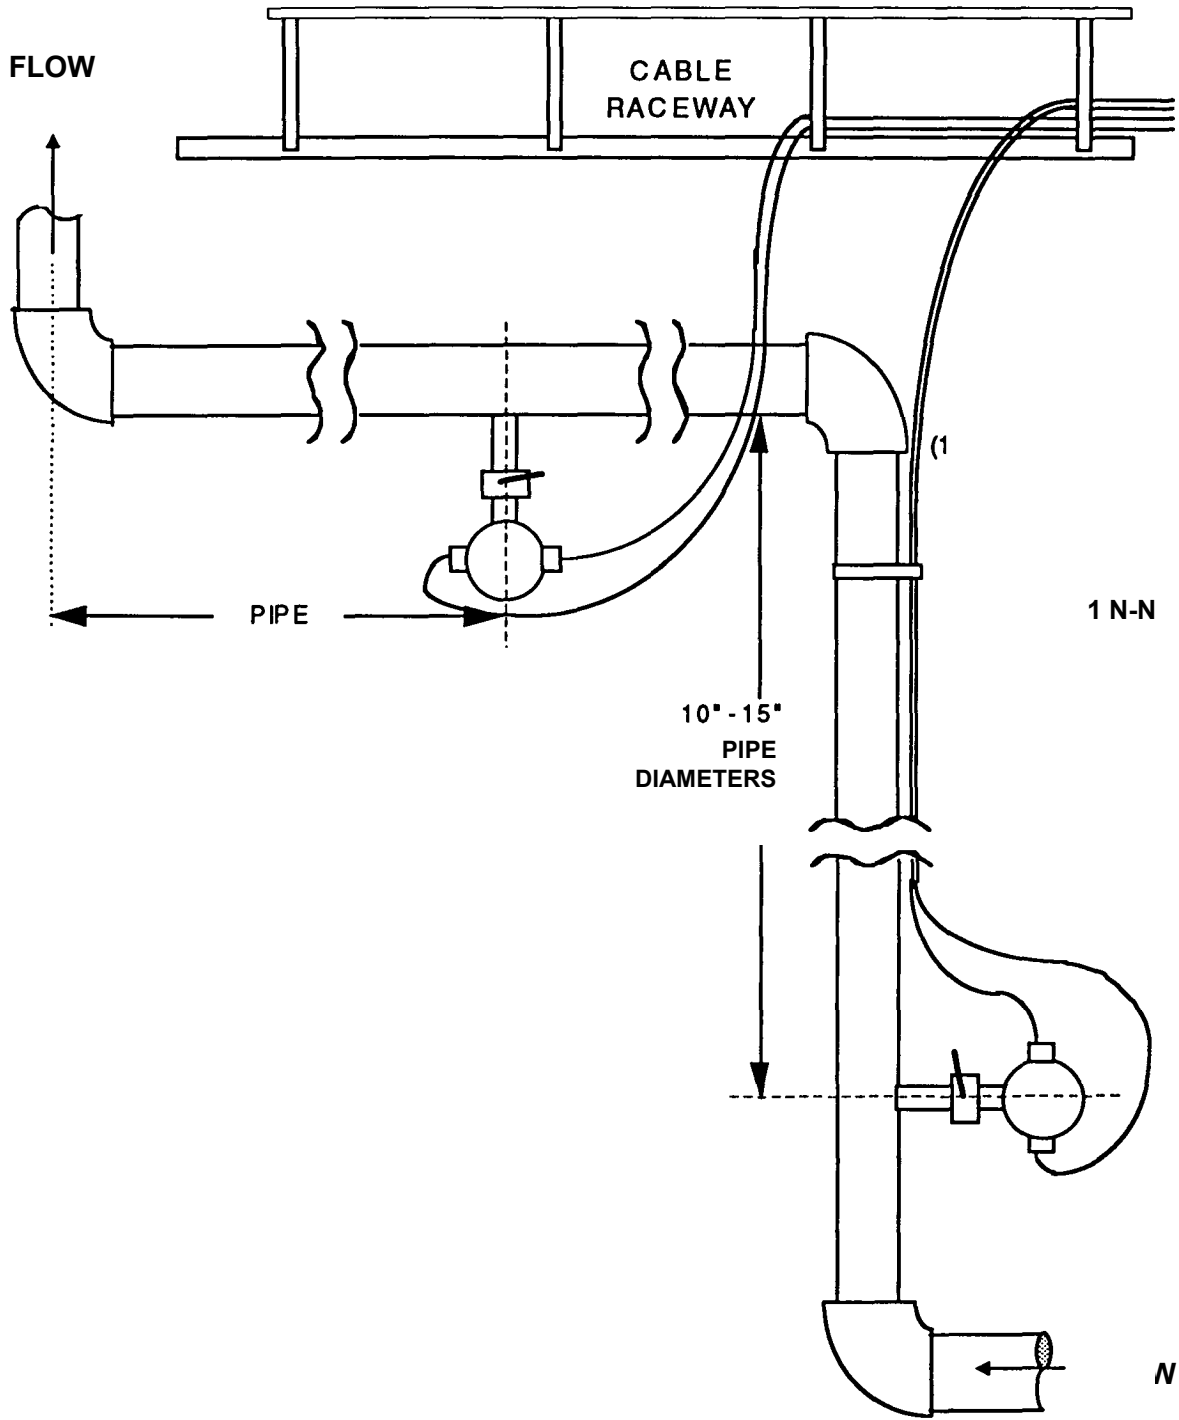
Typical Sensor Assembly Placement and Installation.
